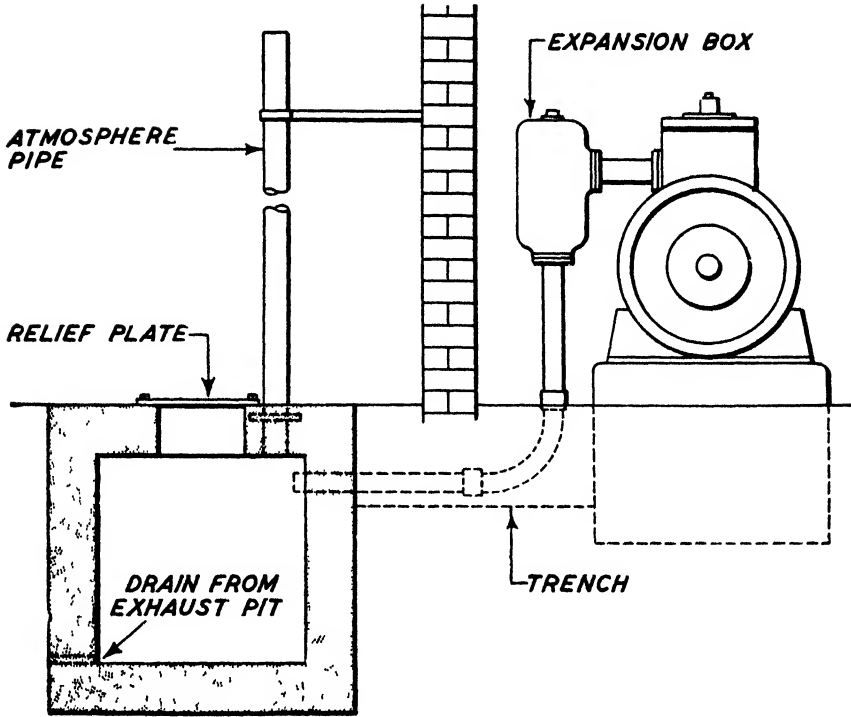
EXHAUST SYSTEM WITH PIT SILENCER
